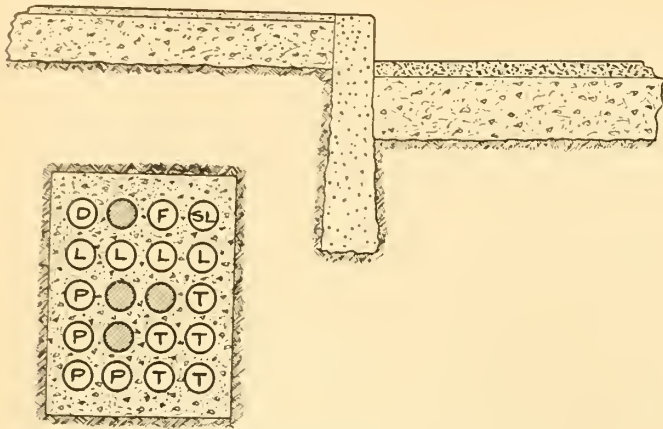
Typical Duct Section and Allotment of Duct Space.
